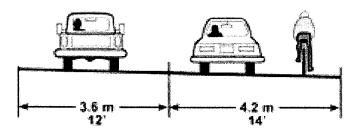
Cross-section of a wide curb lane (Source: Oregon Department of Transportation)
